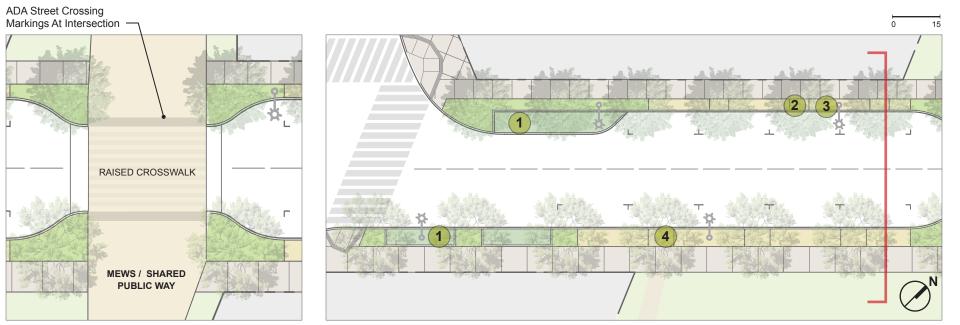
t: Illustrative streetscape plan at intersection of Shared Public Way and Windrow Street crossing.
